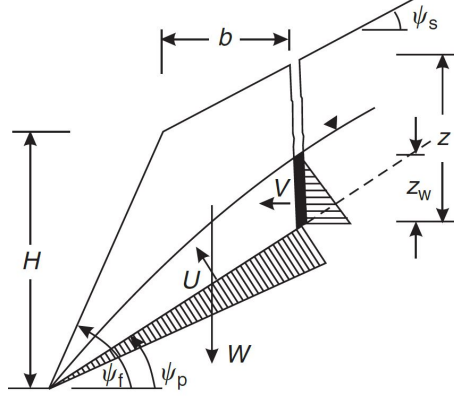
Geometry of slope exhibiting plane failure [44].
